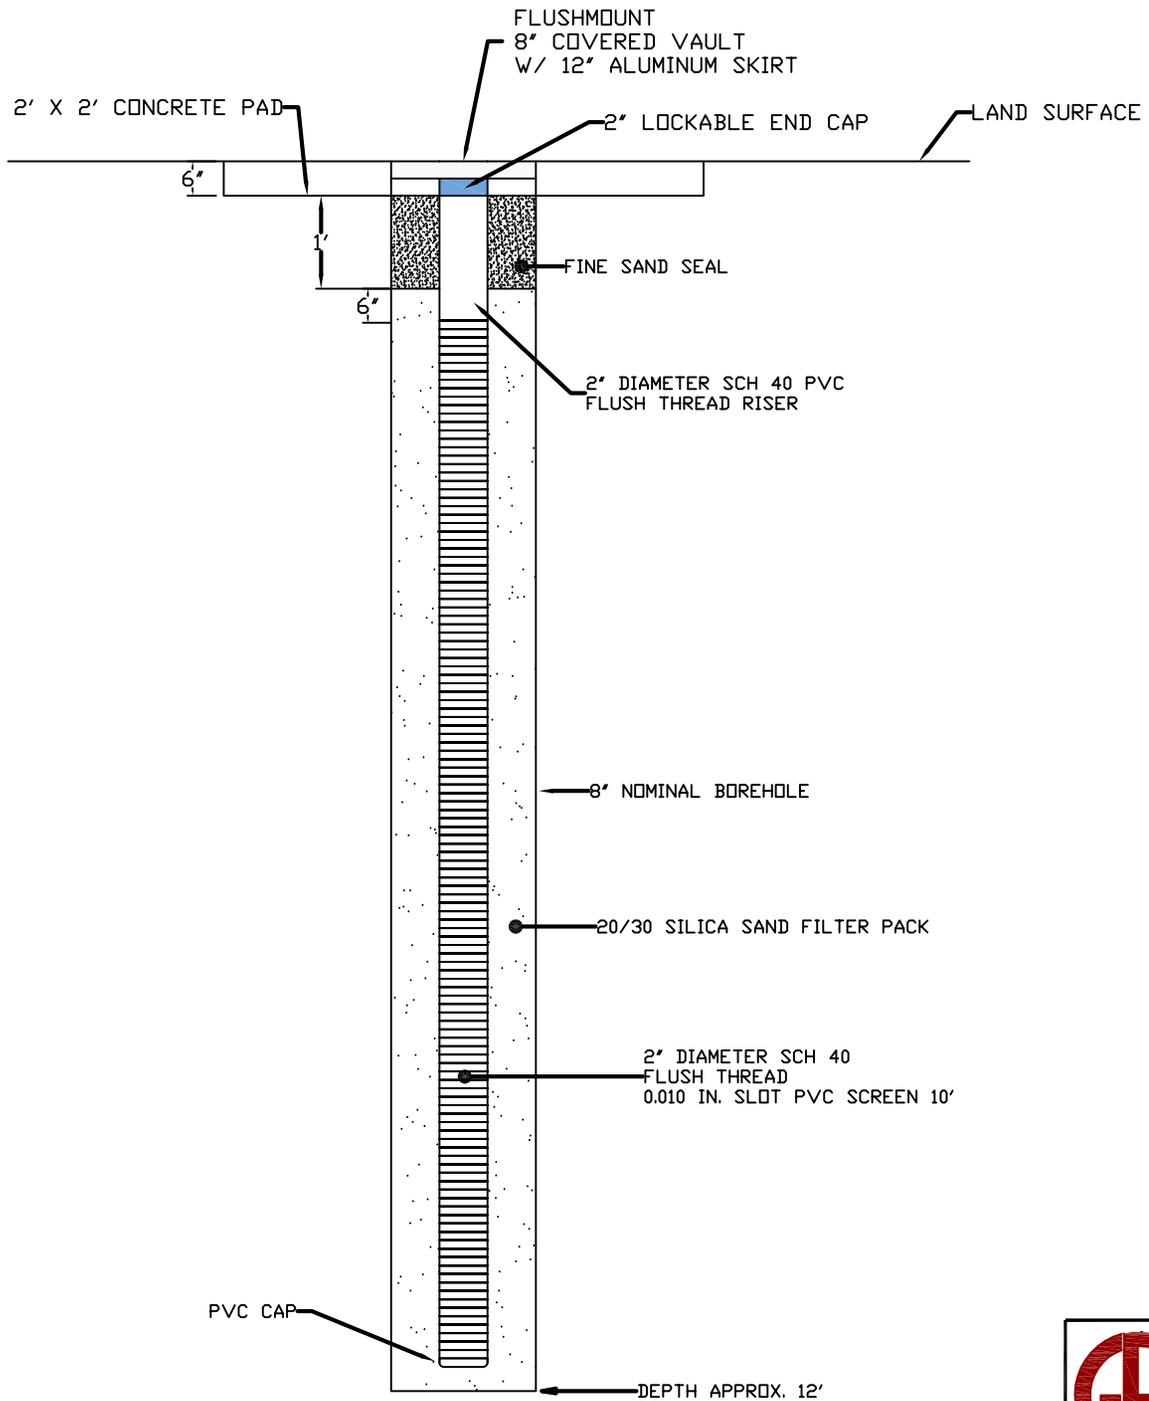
SHALLOW WELL CONSTRUCTION DETAIL
